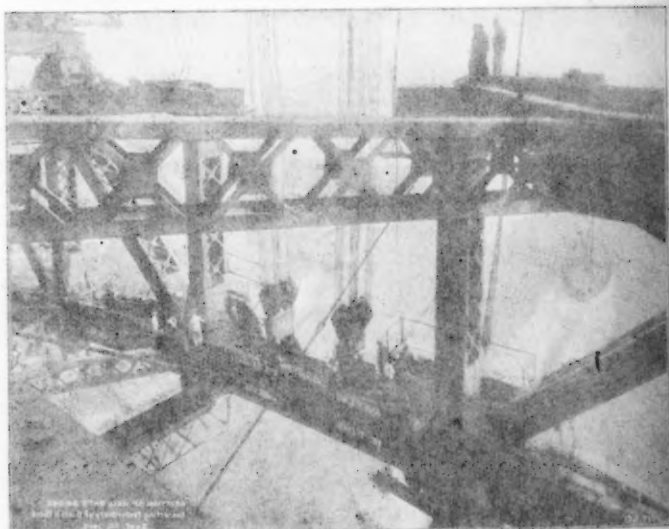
CONNECTING CENTER PANEL OF BOTTOM CHORD, SEPTEMBER 30, 1913.
